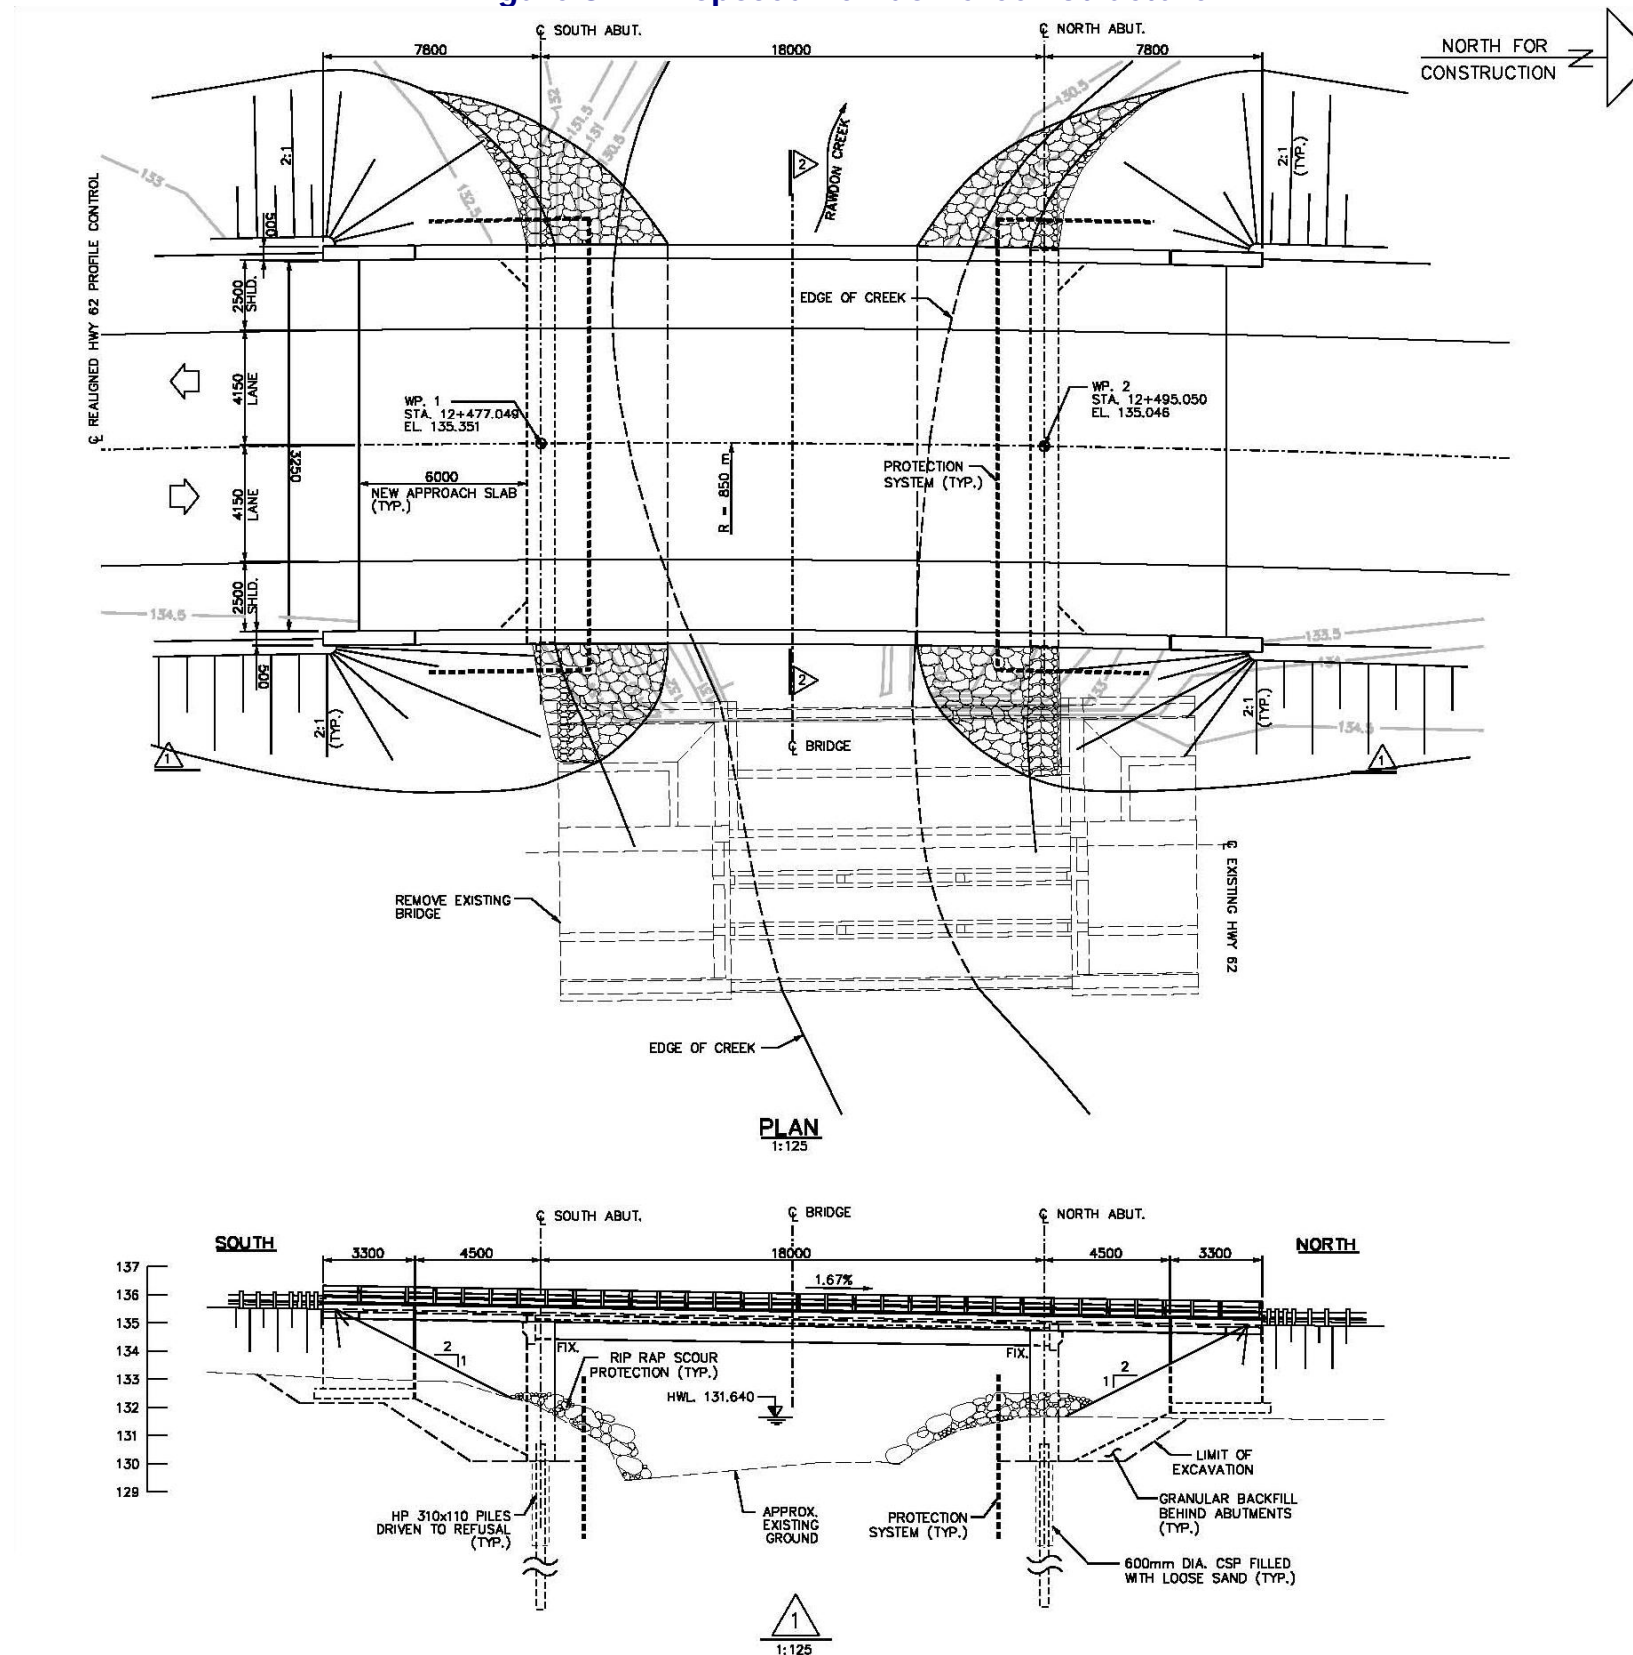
Recommended Plan (Ultimate Improvements)
